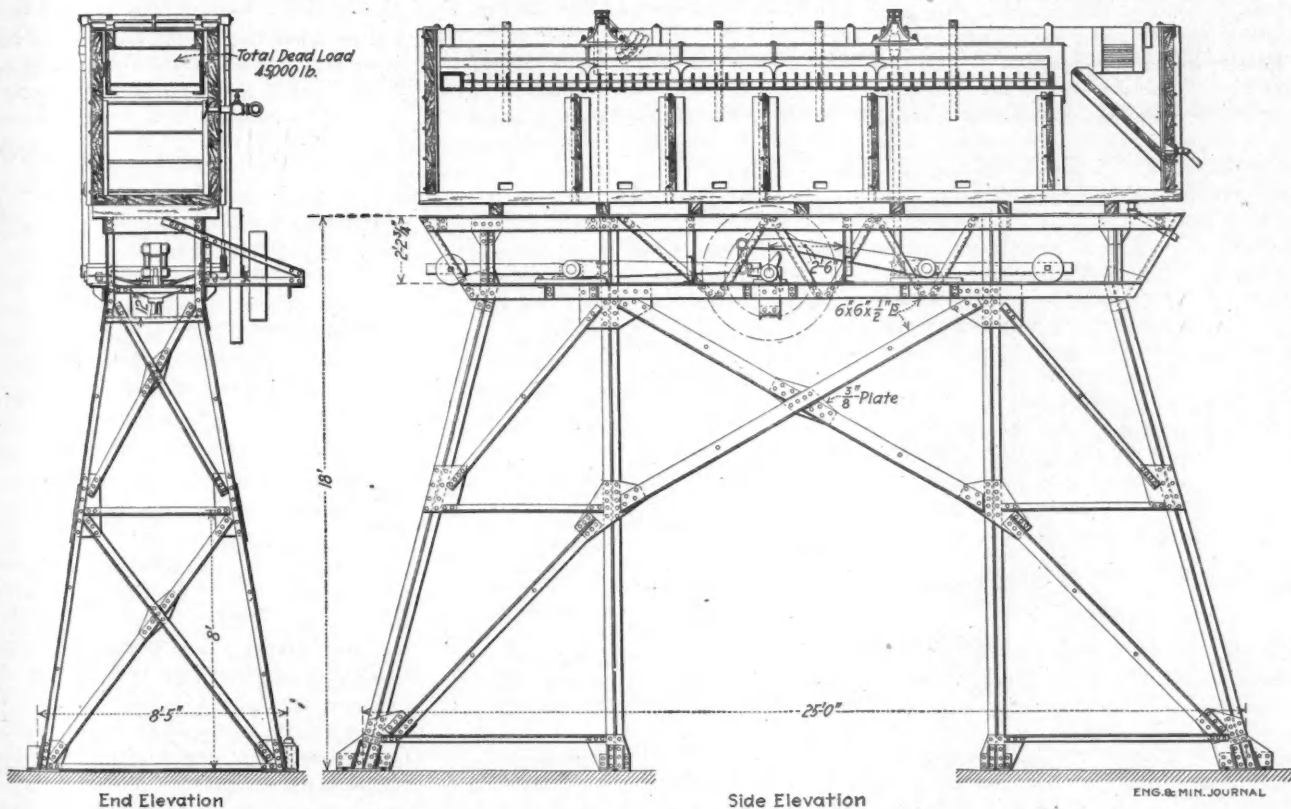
HANCOCK JIG AND STEEL SUPPORT USED IN DOE RUN NO. 3 MILL, SOUTHEASTERN MISSOURI
